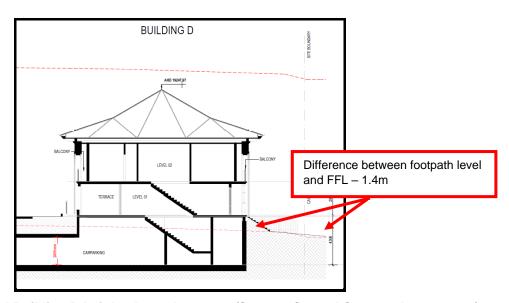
Proposed Building D height above the street (Source: Conrad Gargett, August 2023)
